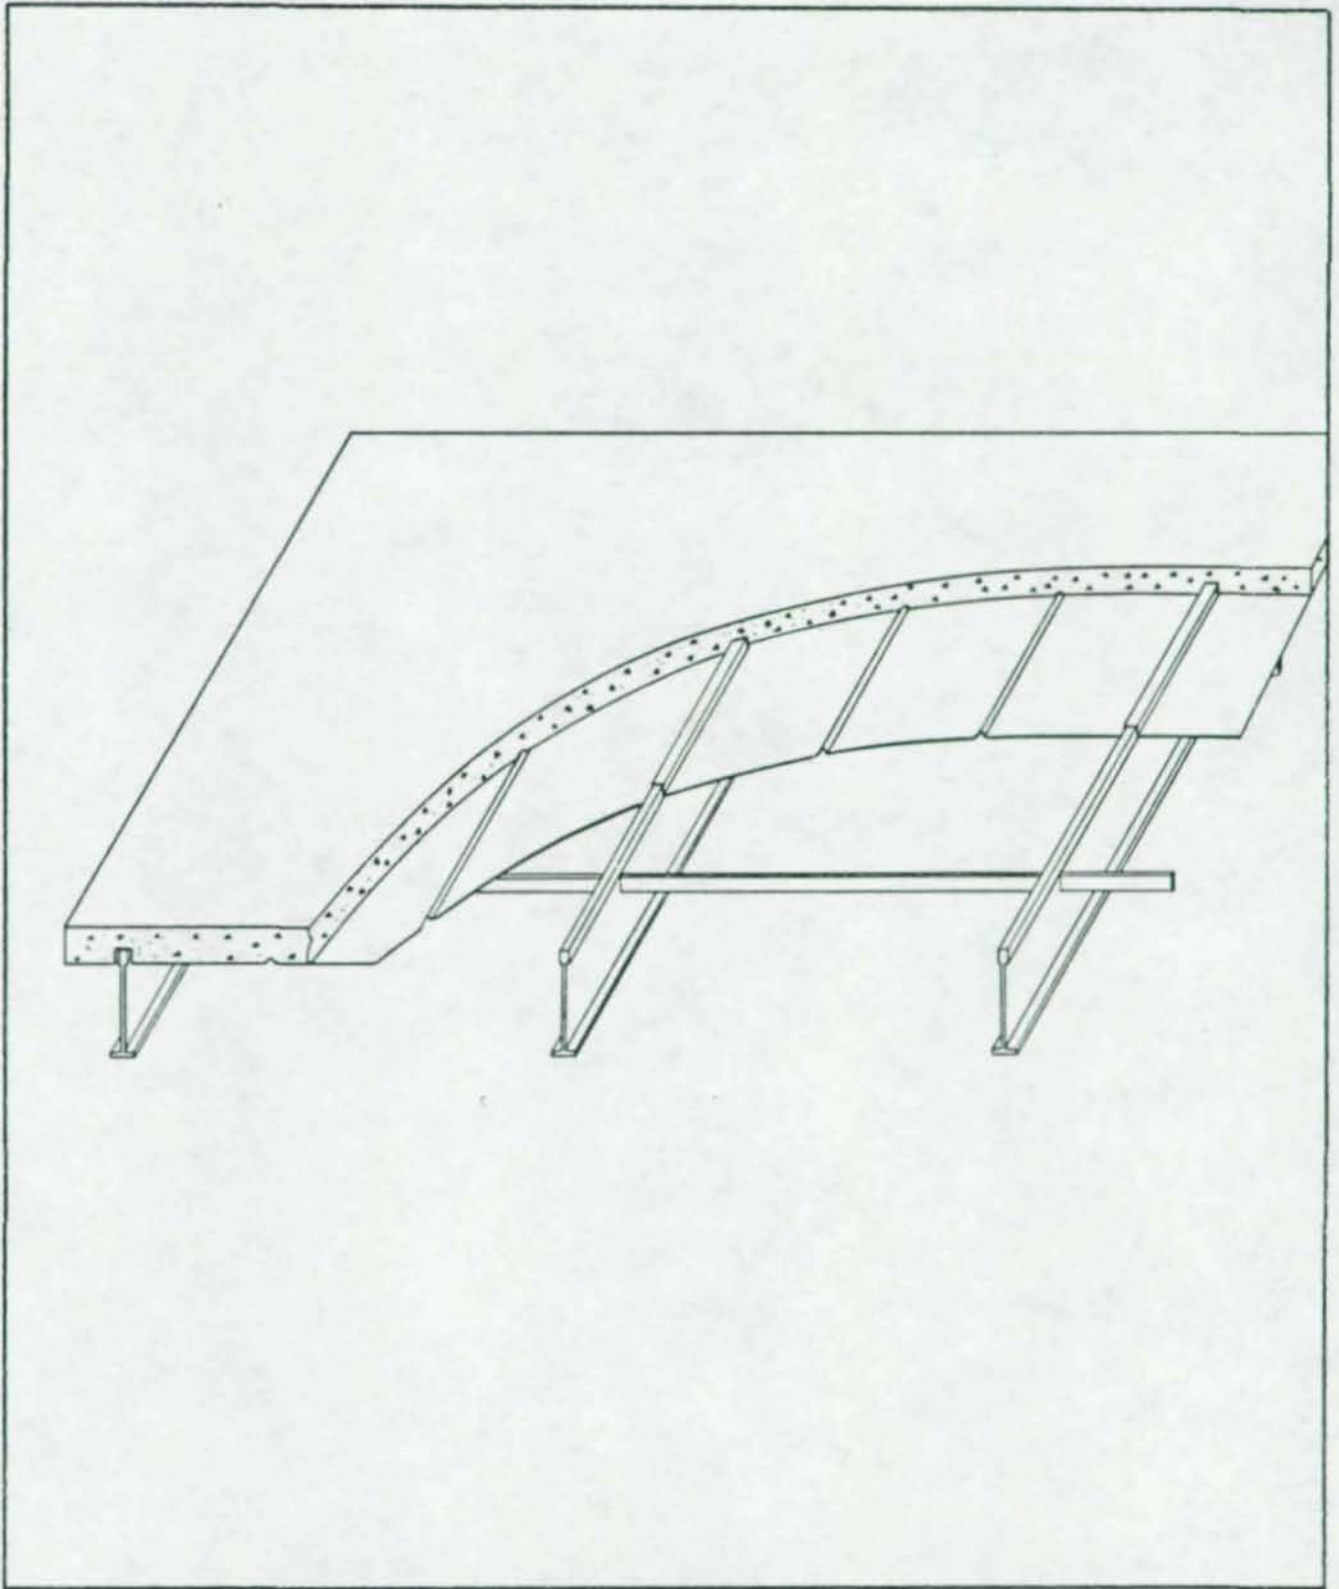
Proposed Steel Grid w/Continuous Profiled Deck & Concrete Slab
